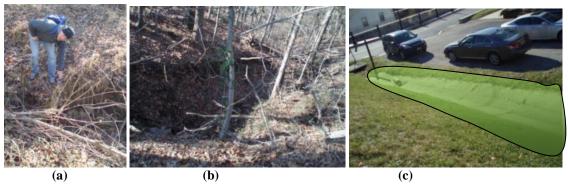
(a) Eroding gully from runoff by courthouse upper parking lot; (b) proposed area to install a regenerative stormwater conveyance system; and (c) concrete channel to be retrofit to a dry swale by the lower courthouse parking lot.
